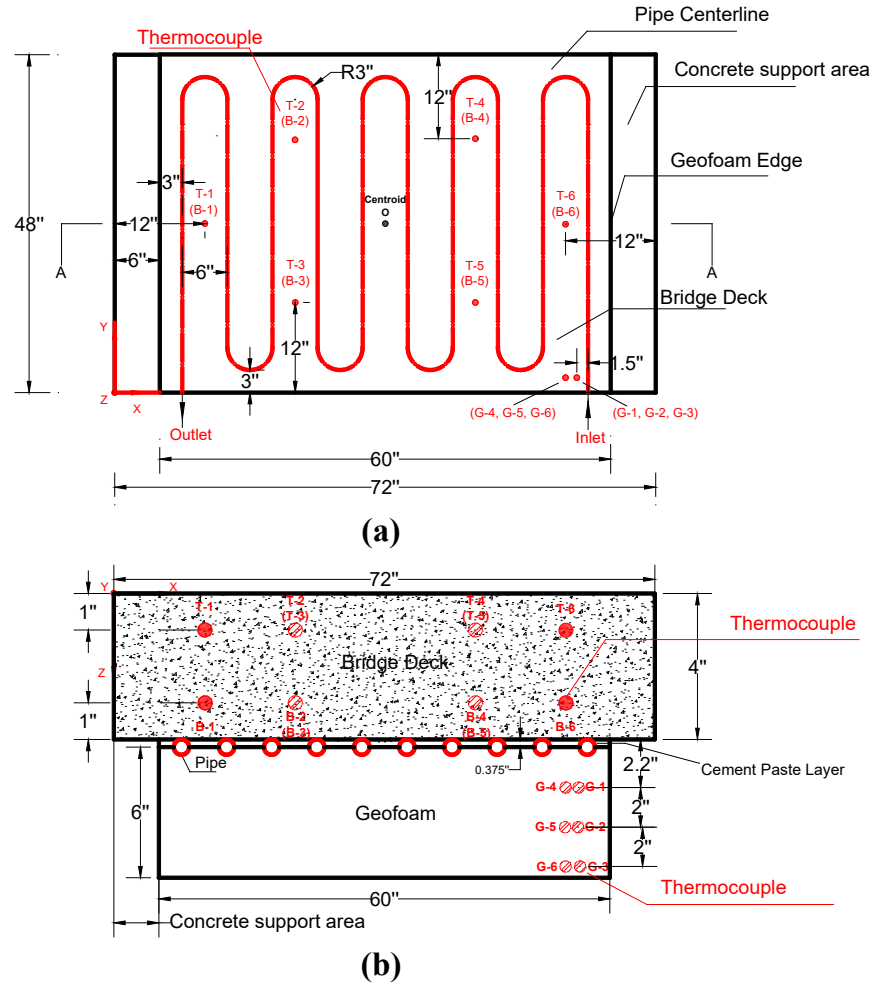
Thermocouple locations within the heated bridge deck and geofoam block: (a) Top view, (b) A-A cross-sectional view (not to scale, 1" = 2.54 cm)
